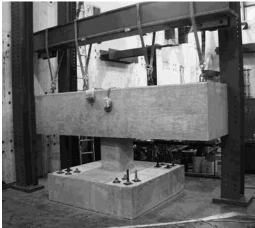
shows the cap in final position, resting on the shims. Three posts were placed under the cap to provide additional stability of the cap during grouting. Two posts were jacked up slightly to help level the cap. The footing is shown tied to the strong floor using four bolt groups.
